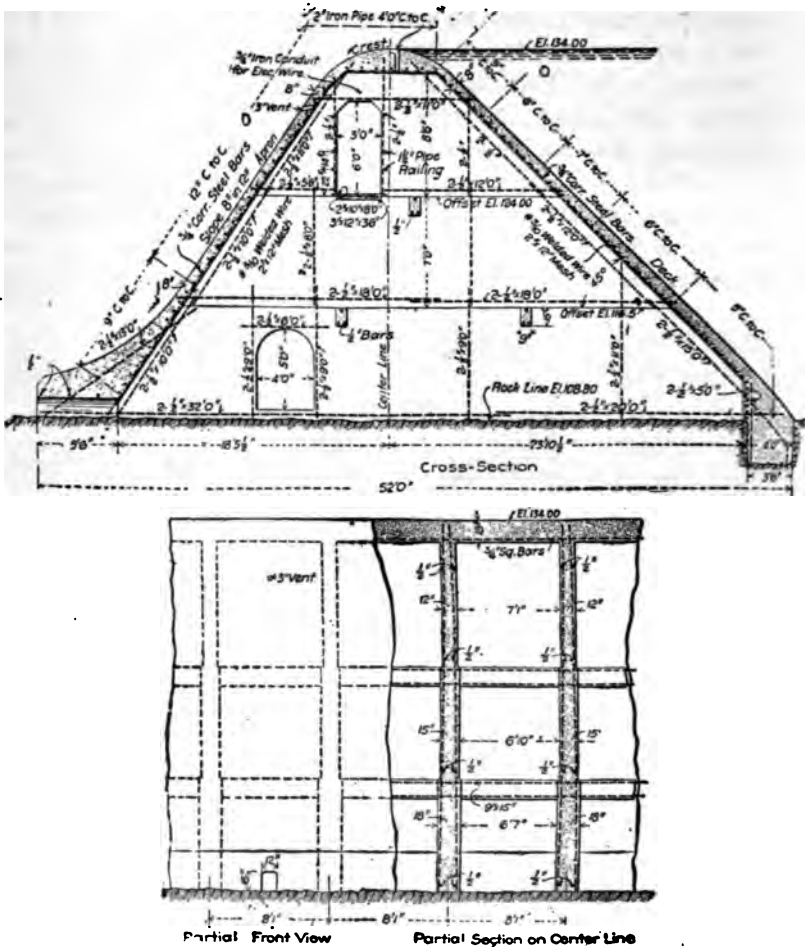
Elevation and Sections of Schuylerville Dam.
